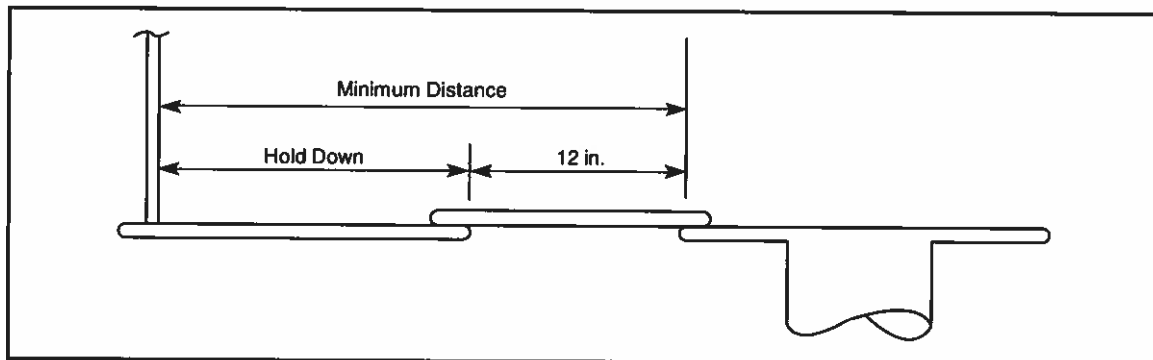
Bottom piping connection of a self-anchored, ground-supported flat-bottom tank
